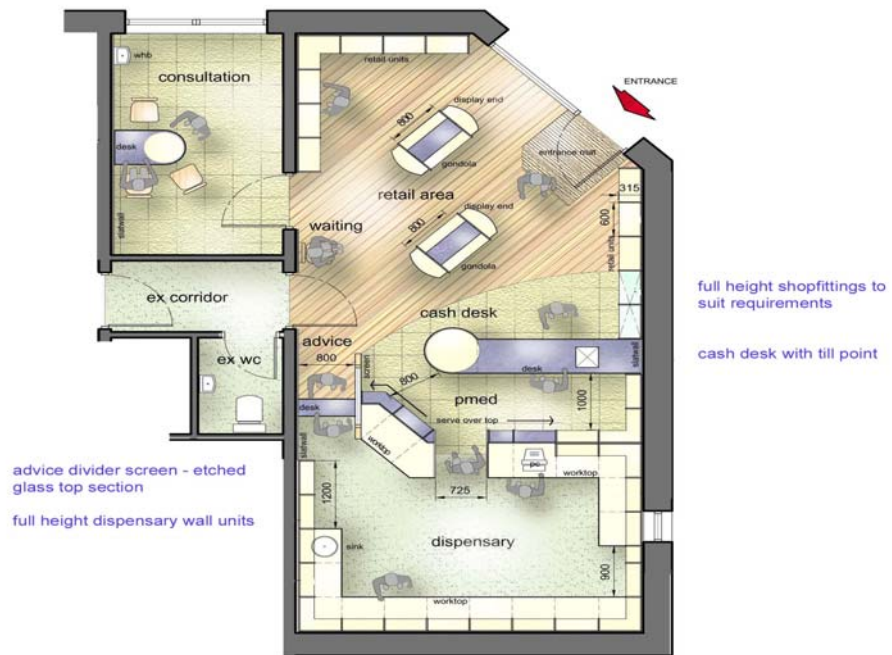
Example of Typical Small Pharmacy Premises – Floor Plan
